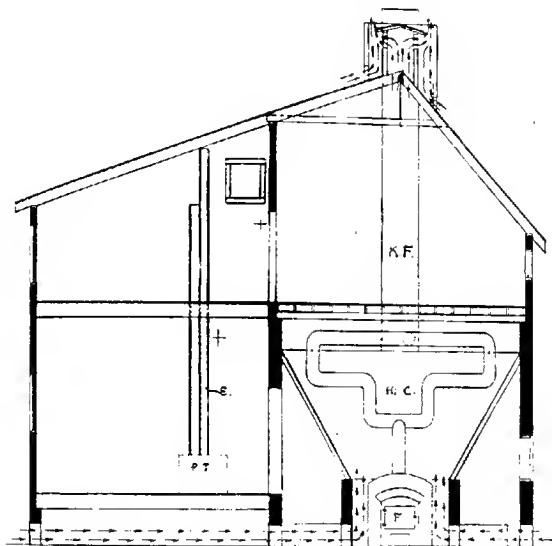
Fig. XVII.—Sectional End View of Building, showing Jacket-and-Hopper Construction.
